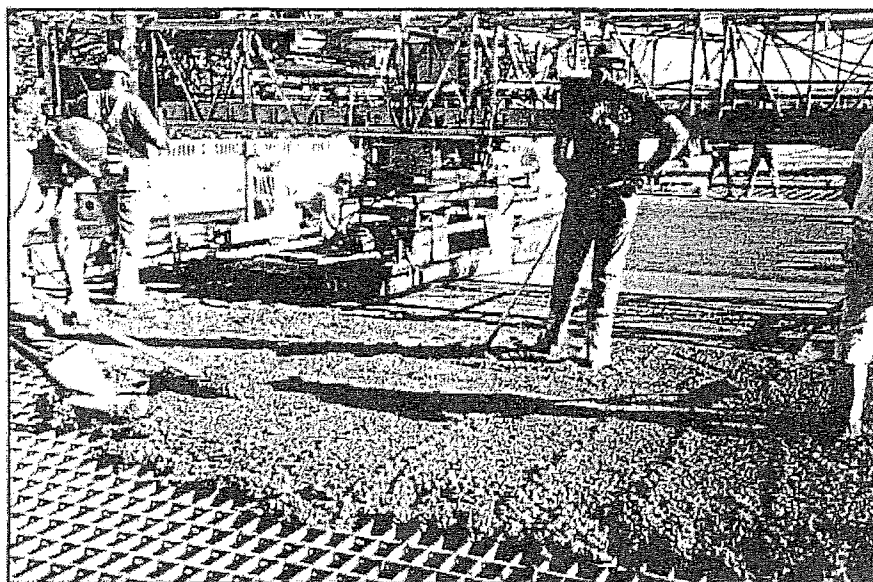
Steel Grid Panel Deck Being Overfilled in Place
